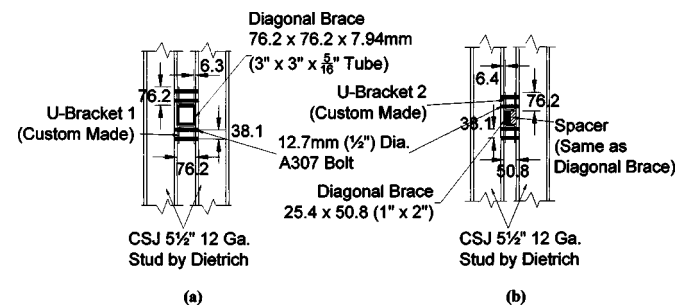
U-brackets-to-cold formed steel stud bolted connection details: (a) F1; and (b) F3
